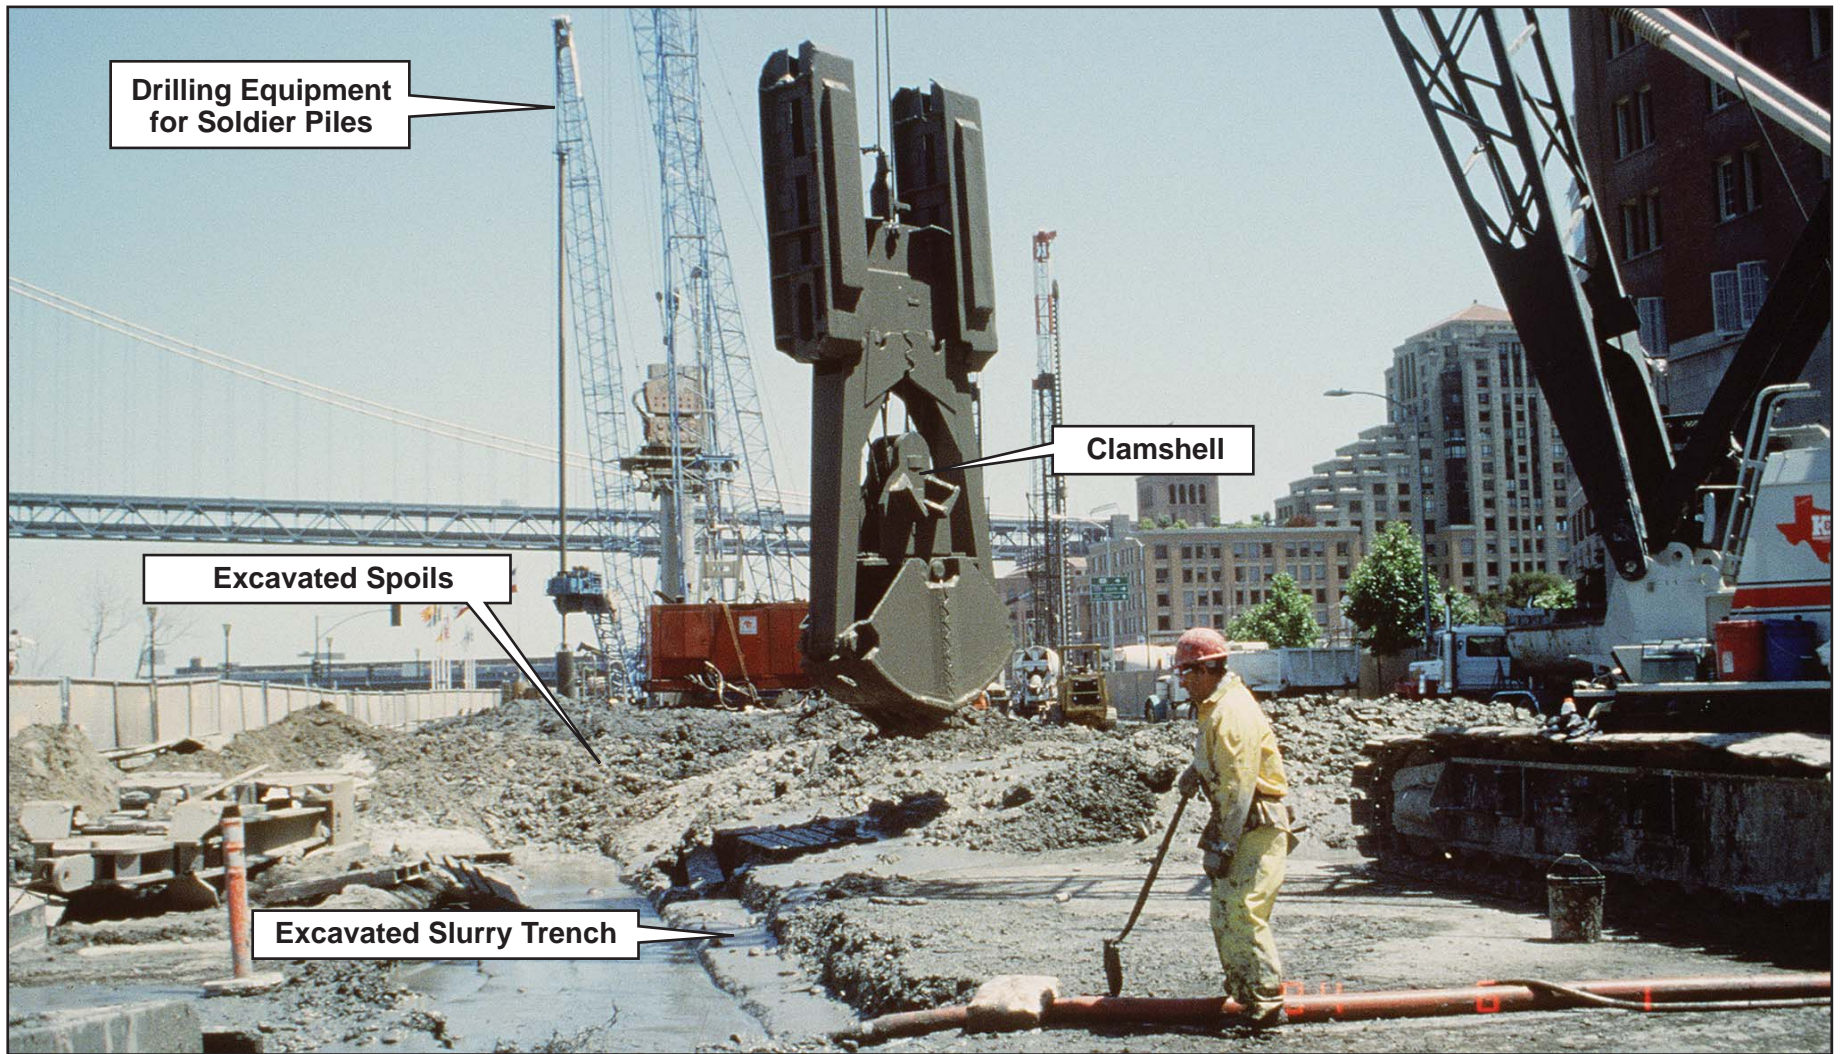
Construction of Soldier Piles for SPTC Wall
